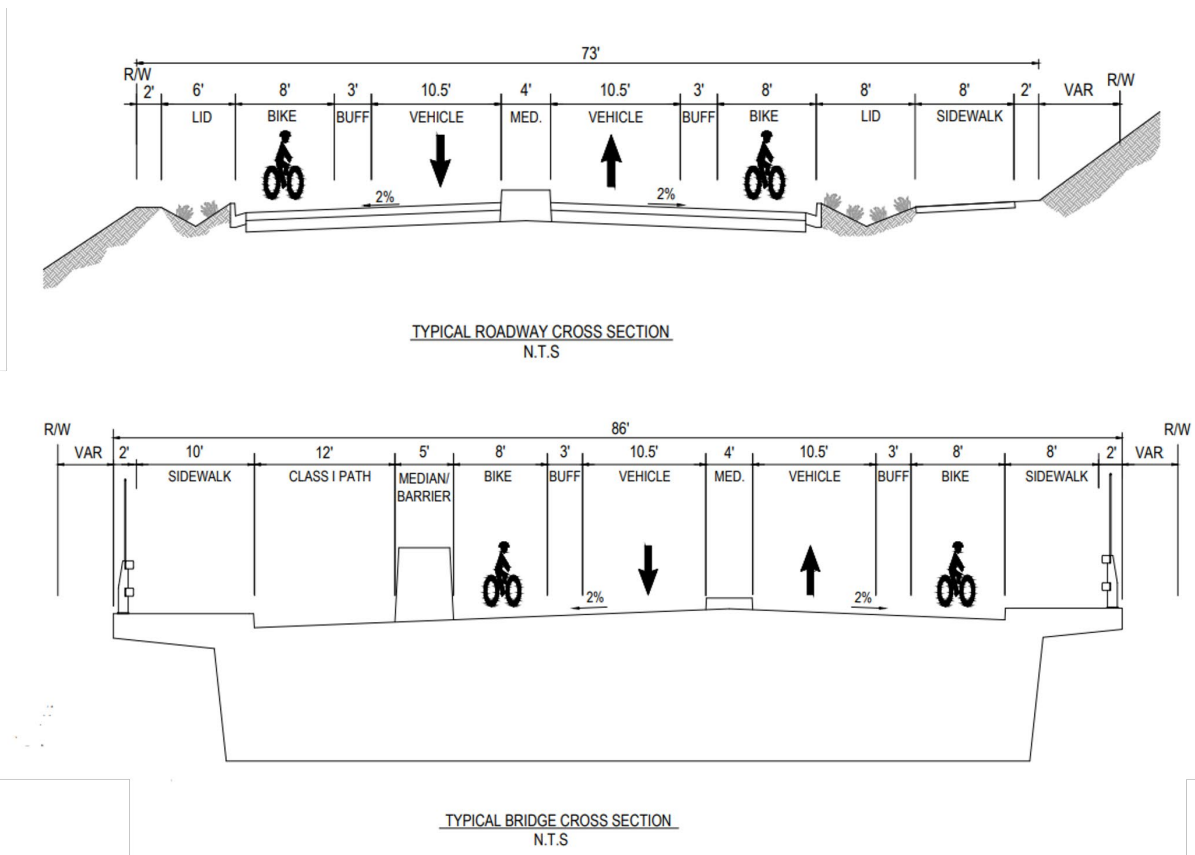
Typical Roadway (above) and Bridge (below) Cross Sections
